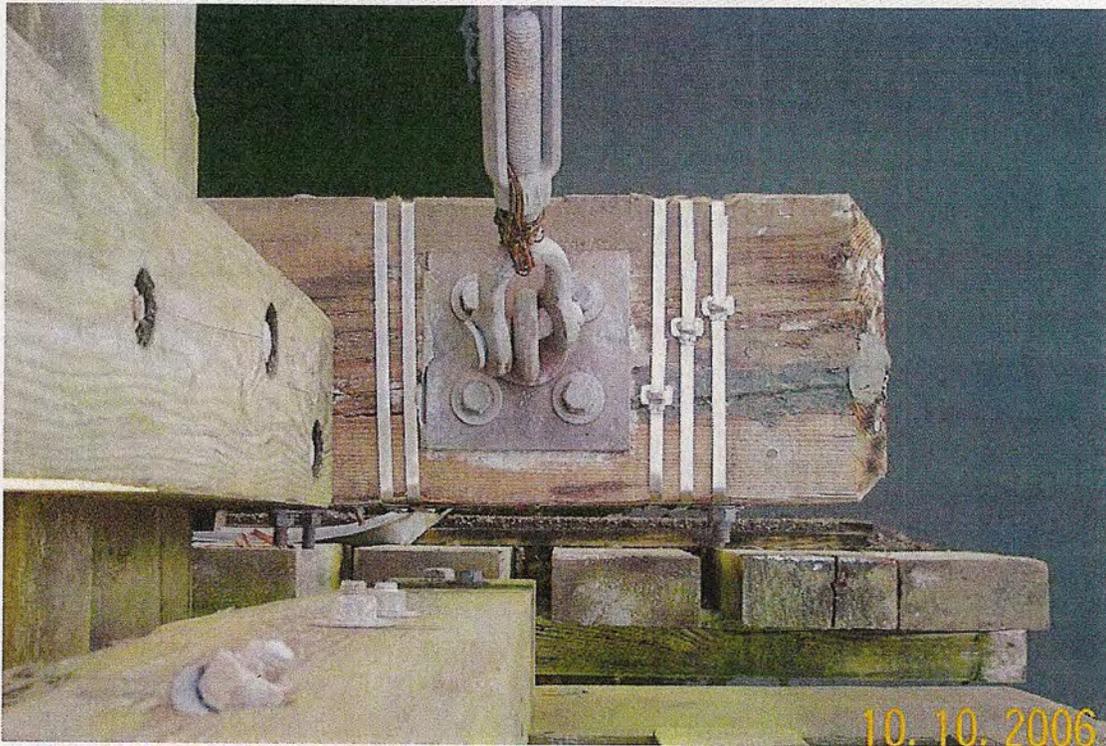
Temporary repair to the north end of the bascule span (Span 8) timber lifting beam, looking west and down.
